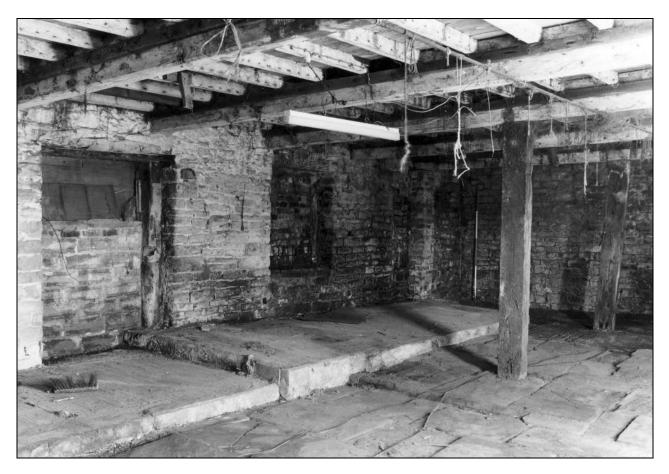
Building 1a: ground floor, from the south-east (film 3, frame 8)
